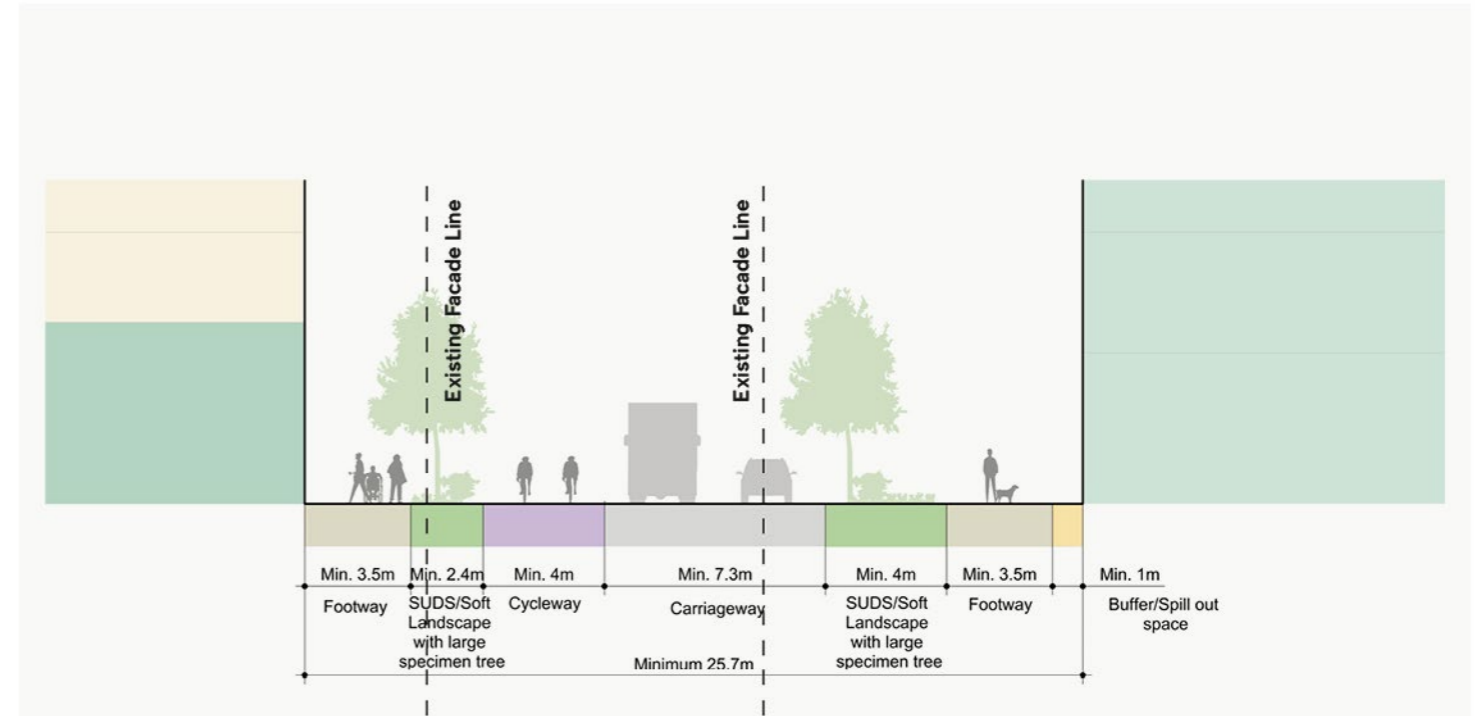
Section A: Cross section of the mid-term intervention of Albert Crescent South
